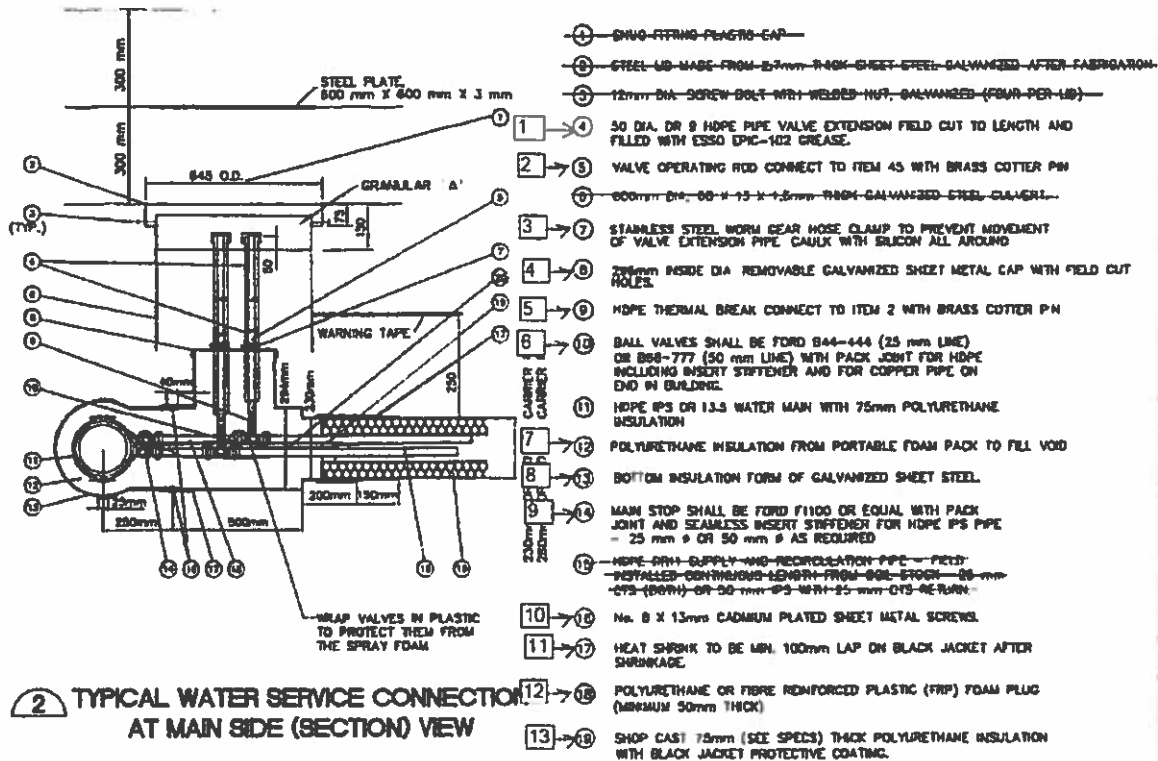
Detail 2 - from Drawing C-330 - Water service connection Kit at main
